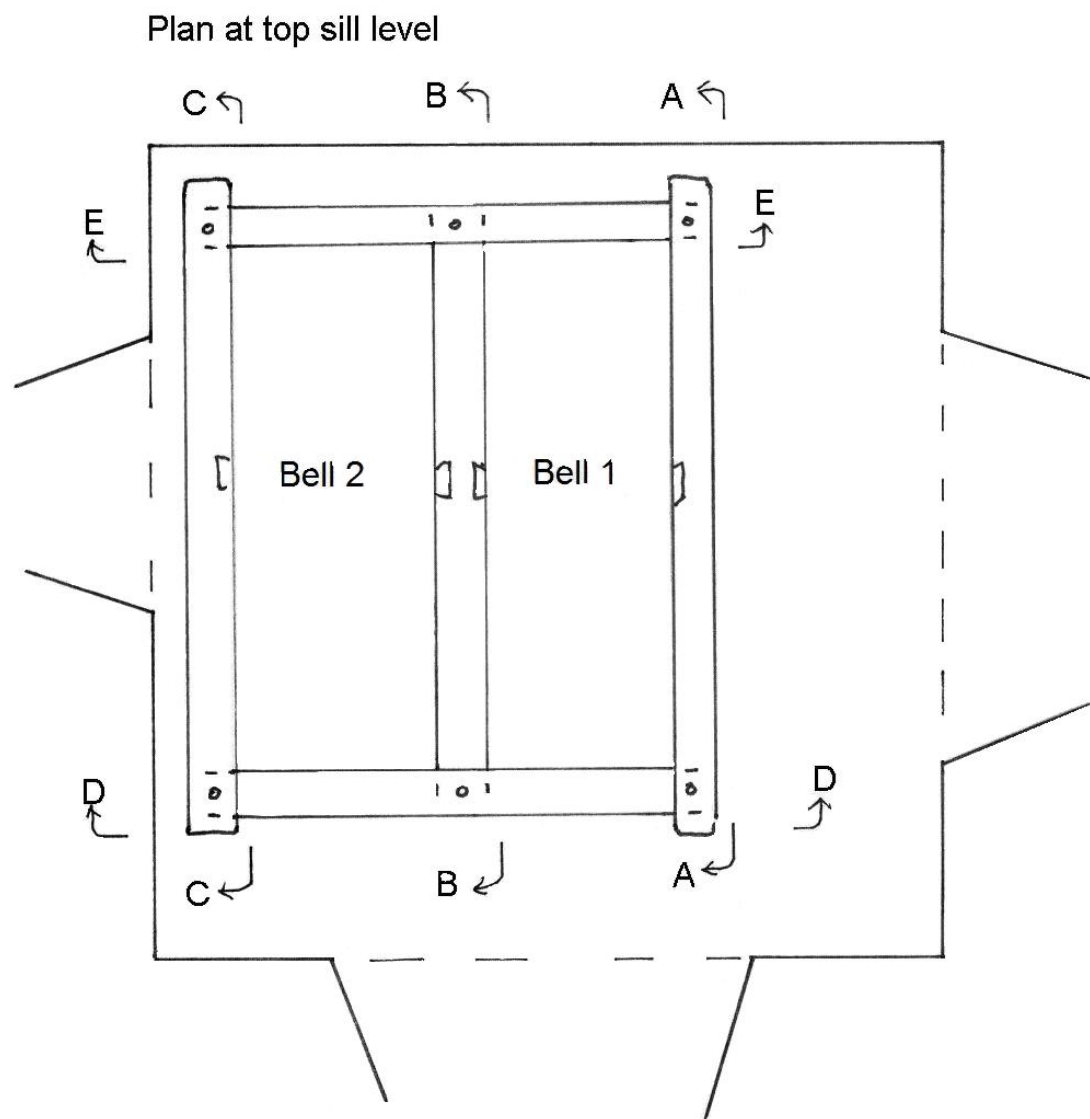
Plan of bellframe, showing truss labelling (George Dawson)
